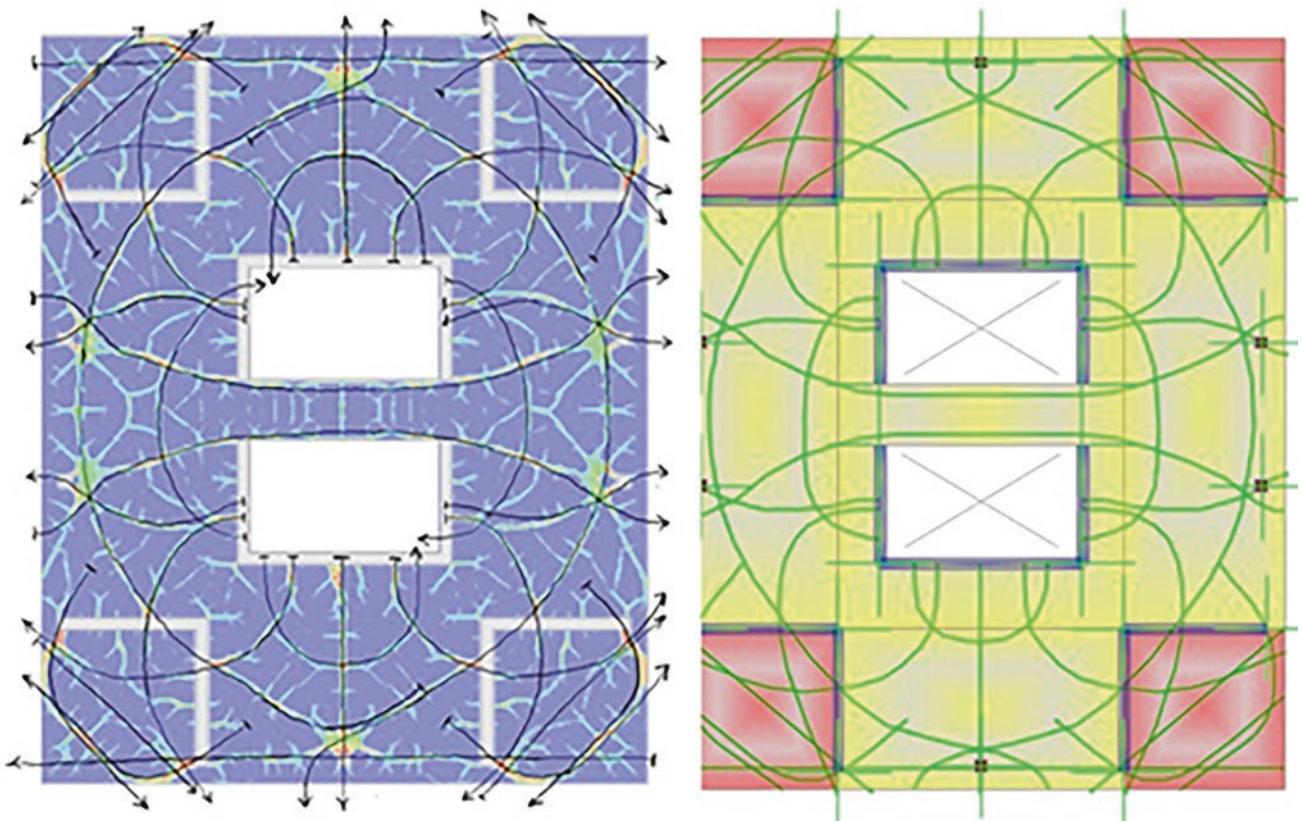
Optimized post-tensioning layout in plan – 1111 Sunset Boulevard Towers, Los Angeles, CA
